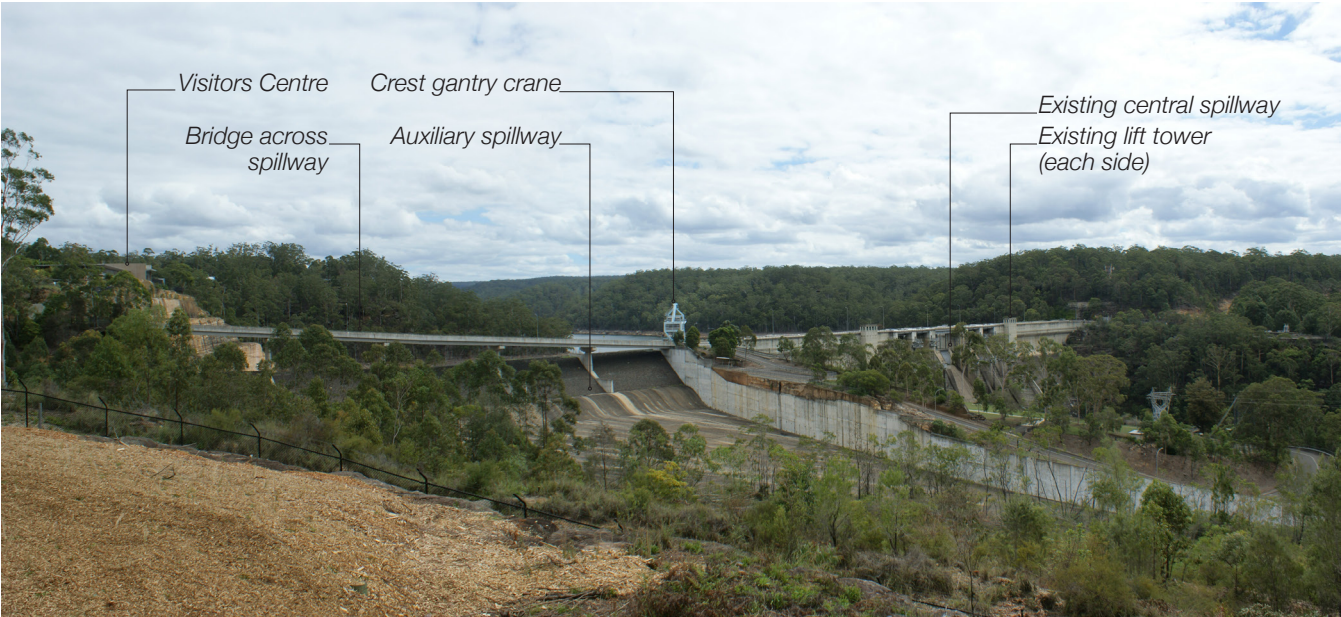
Viewpoint 2-3 - Existing north-west view from the 18th Street Lookout
